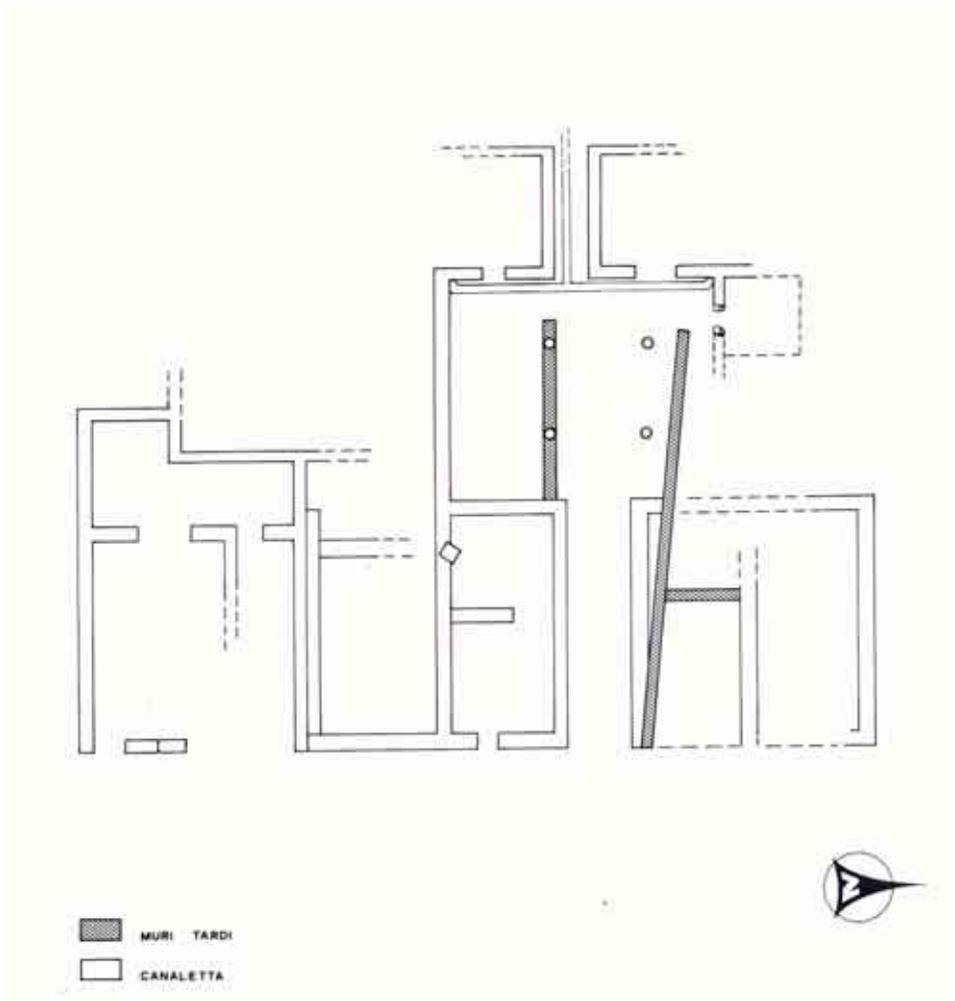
House north of the tetrastyle. Sketched plan, main rooms.
